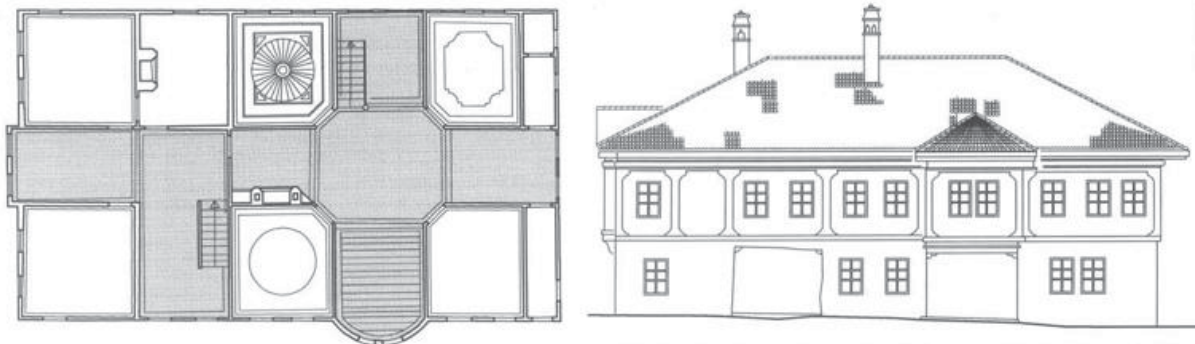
Plan layout of main living floor and facade of a Turkish House [10]
